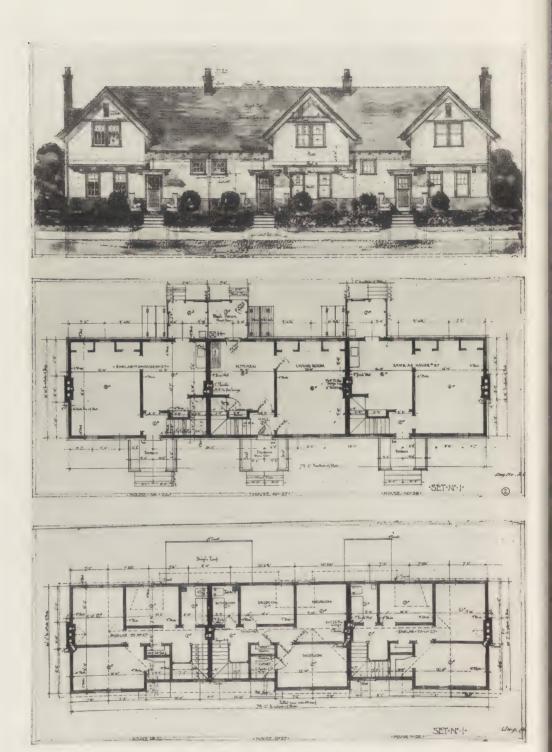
ELEVATION AND PLANS OF THREE-FAMILY HOUSE—ALUMINUM CO. OF AMERICA, MASSENA, N. Y. ALBERT H. SPAHR, ARCHITECT.
